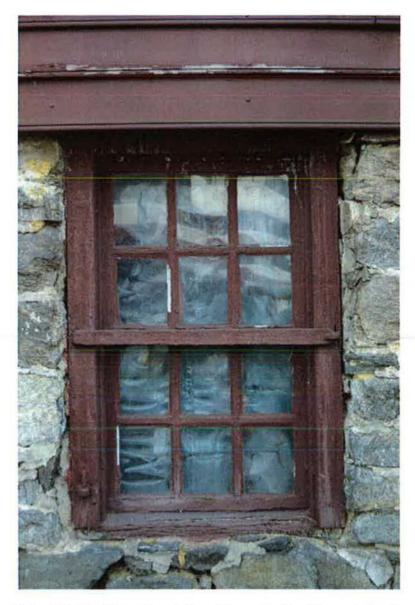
Detail of the cellar window at the south side of the west elevation, looking east.
